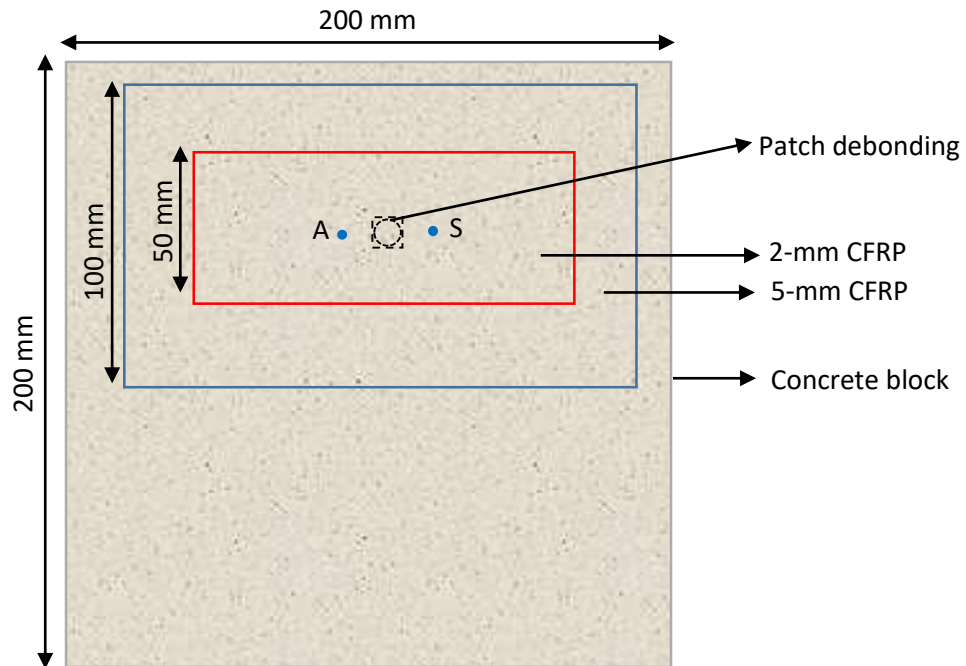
Schematic of experimental setup showing the position of CFRP plates on the concrete block with patch debonding in specimen 4 and 5.
